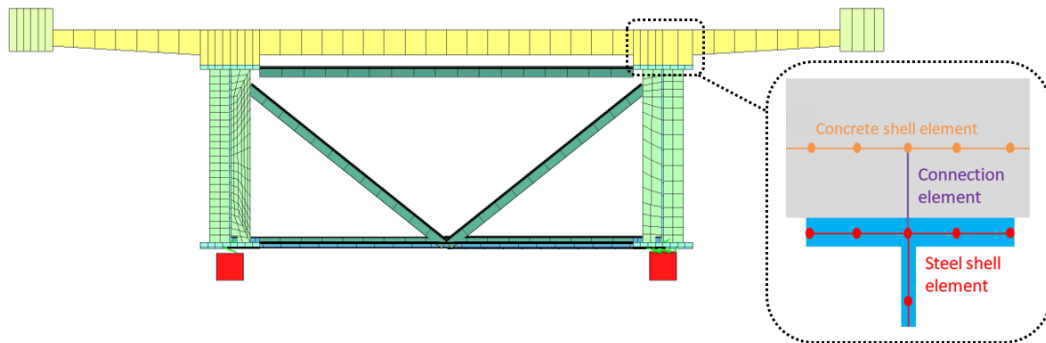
Bridge cross section with a schematic illustration of the steel-concrete interface
